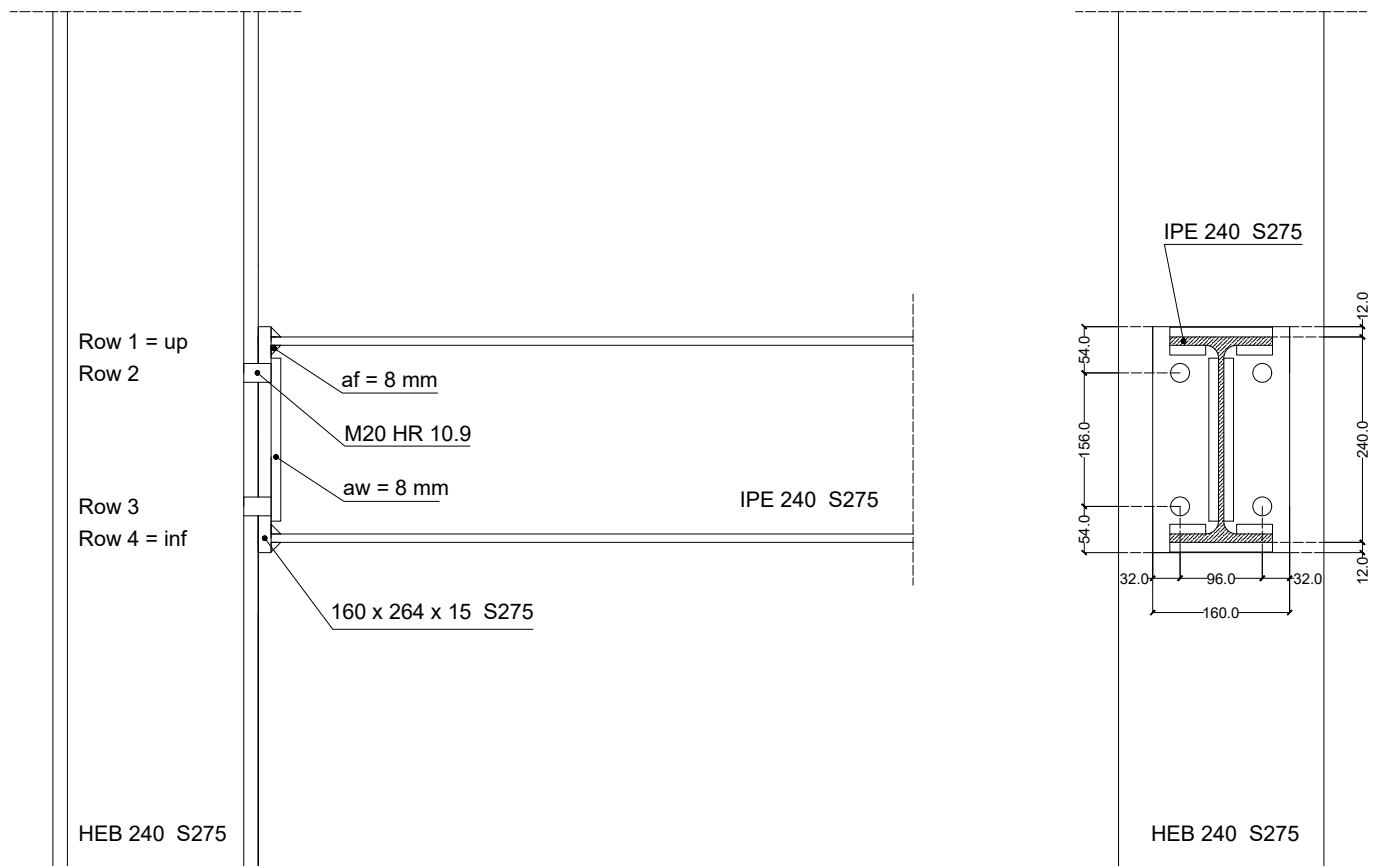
Coimbra - Flush end-plate joint configuration - Technical drawing
